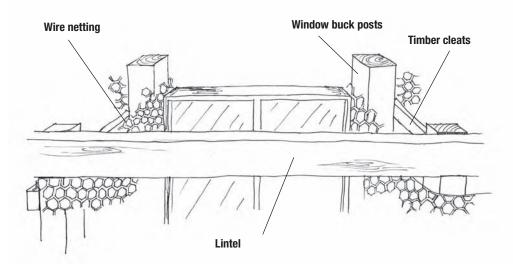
Wire netting over posts and frame of window buck for an externally located window with a pitching beam installed level with the internal wall
